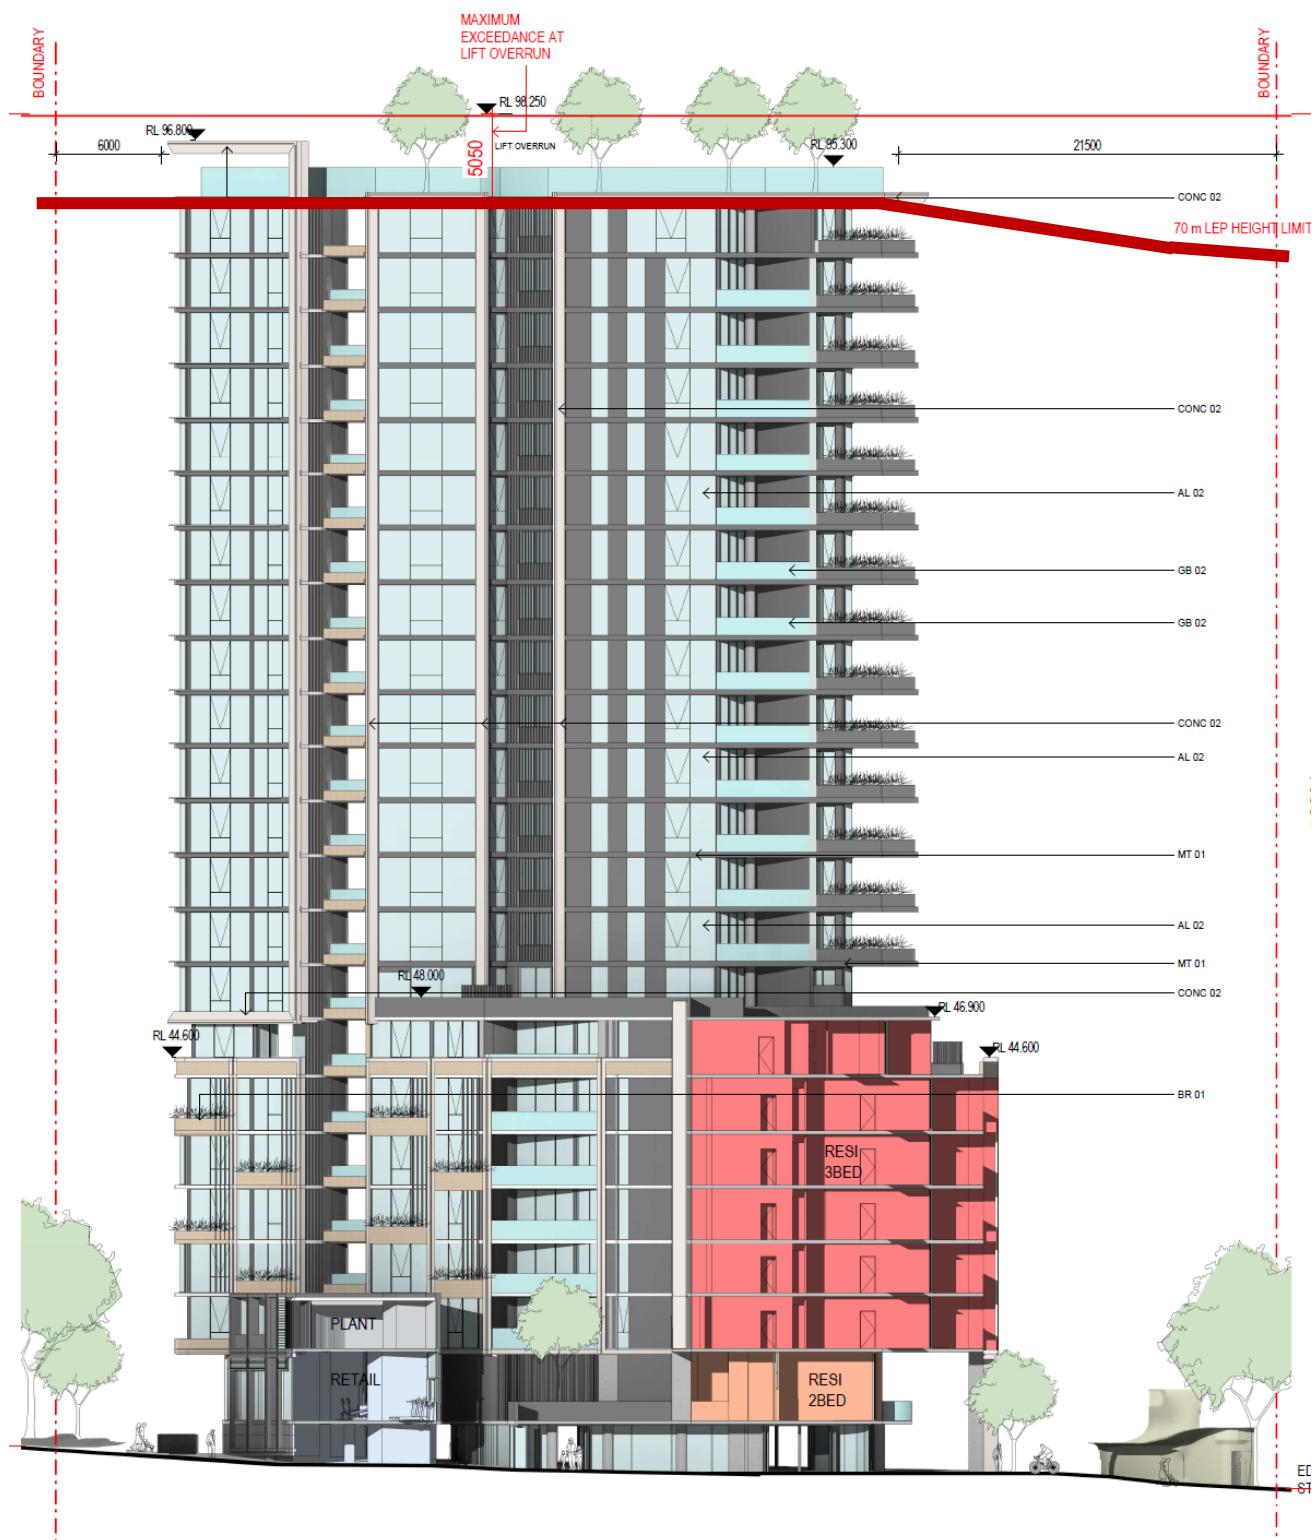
Building B – Elevation with 70m height plane (highlighted in dark red)
